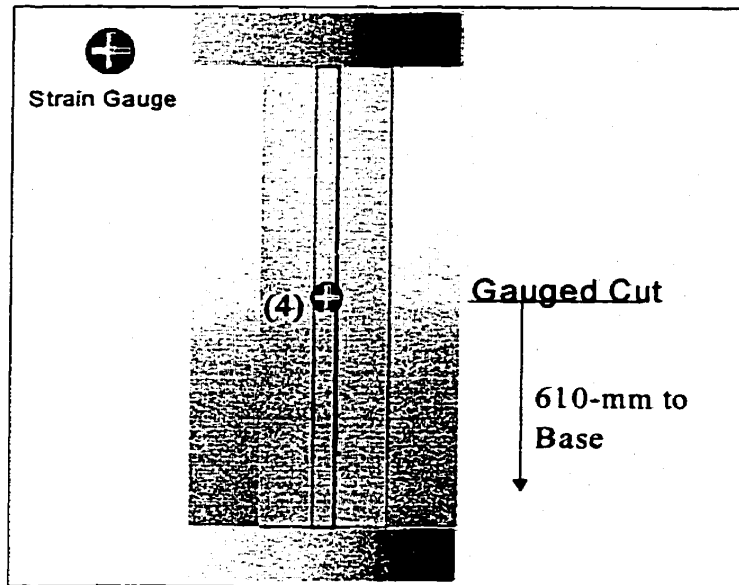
Strain gauge location on compression side of Phase III specimens.
